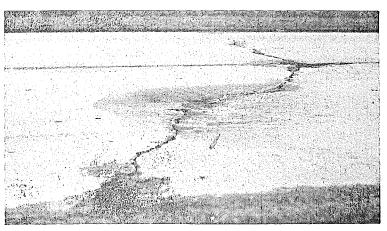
Pumping. The ejection of water or mixtures of water and clay or silt along transverse joints and cracks and along pavement edges caused by downward slab movement activated by the passage of heavy axles over the pavement, after the accumulation of free water in the subgrade or subbase. Sometimes termed "mud pumping" or "water pumping."
